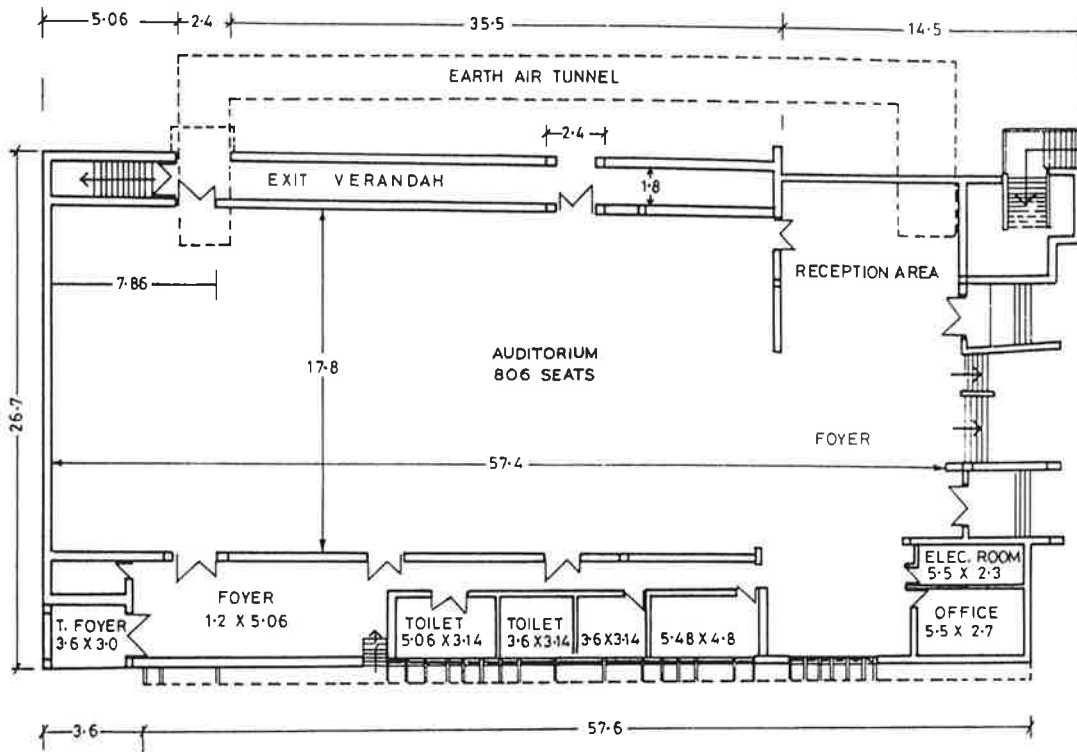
Floor layout plan of the proposed cinema hall (all dimensions are in metres).
